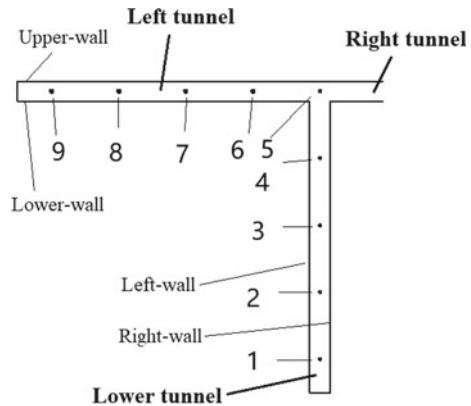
Plan sketch of L-shaped tunnel explosion point
